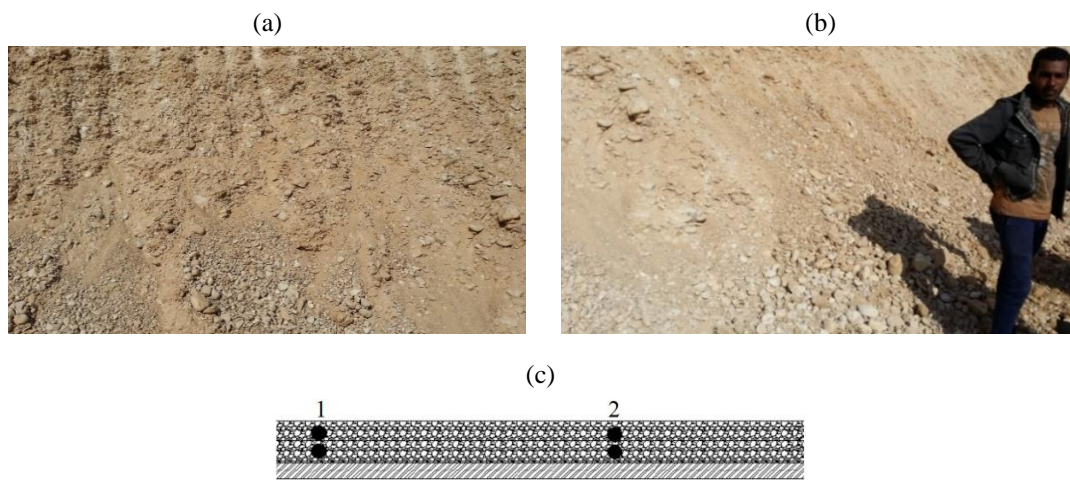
Location of sample procurement for Elgeash Road: (a) wall side section 1; (b) wall side section 2; (c) sample location with depth
